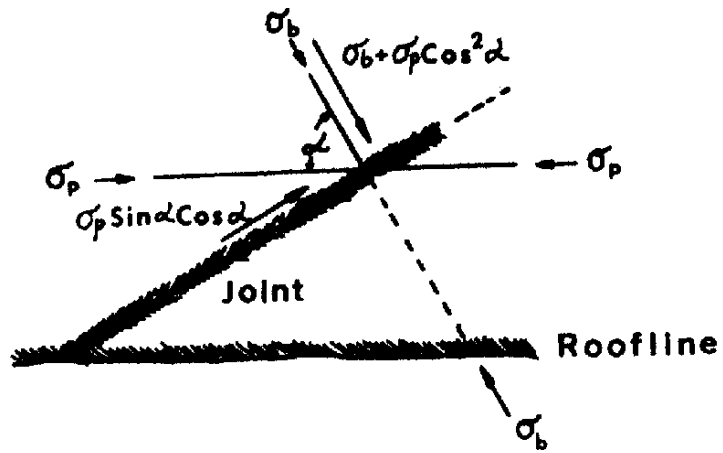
a Bolt installed inclined to the roofline (Peng, 1984)
